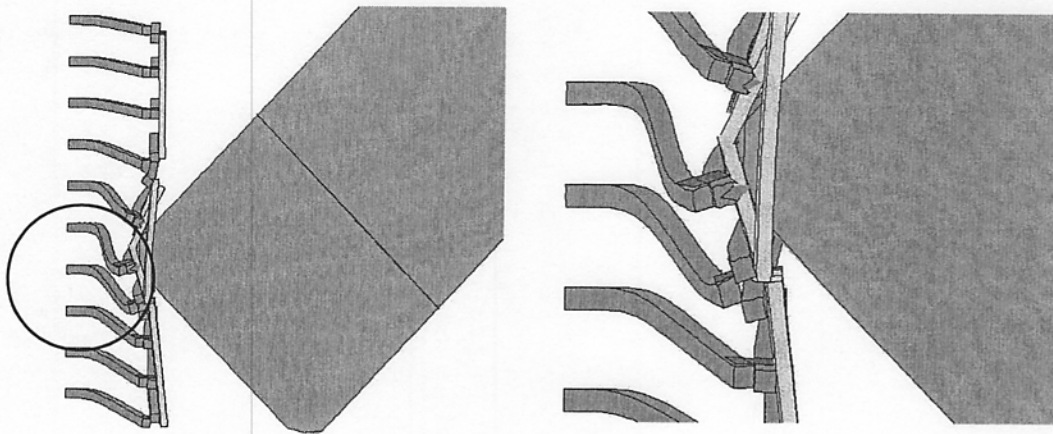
Damage to the Fender Modified by Steel Plates; 45° Impact
